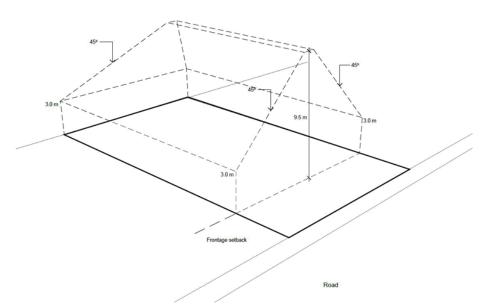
Building envelope as required by clause 11.4.2 A3(a)
